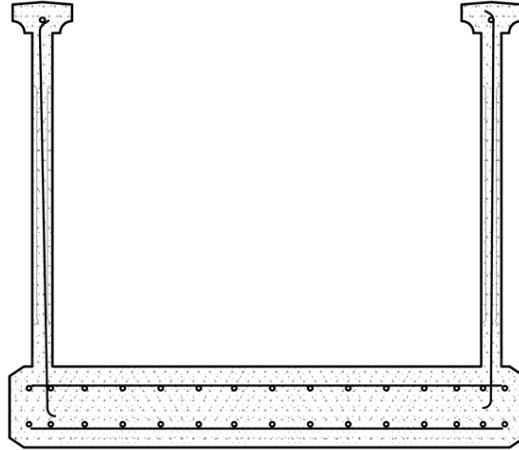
Cross section showing deck reinforcement layout. Source: Tim Michiels, Old Structures Engineering, March 24, 2021.
